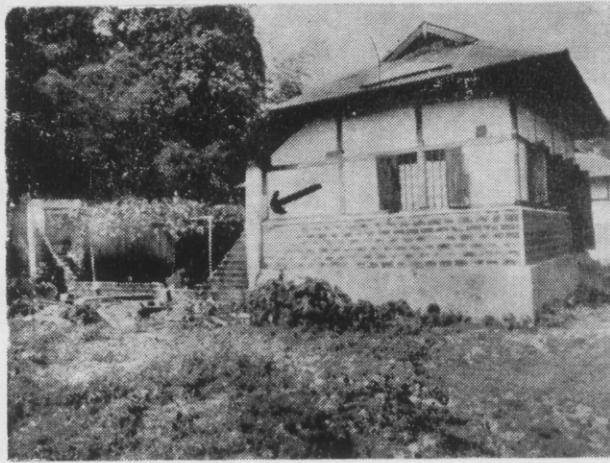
A view from left side of the building in figure 13-the broken masonry generally showed shearing of the bricks rather than splitting along the plaster.
